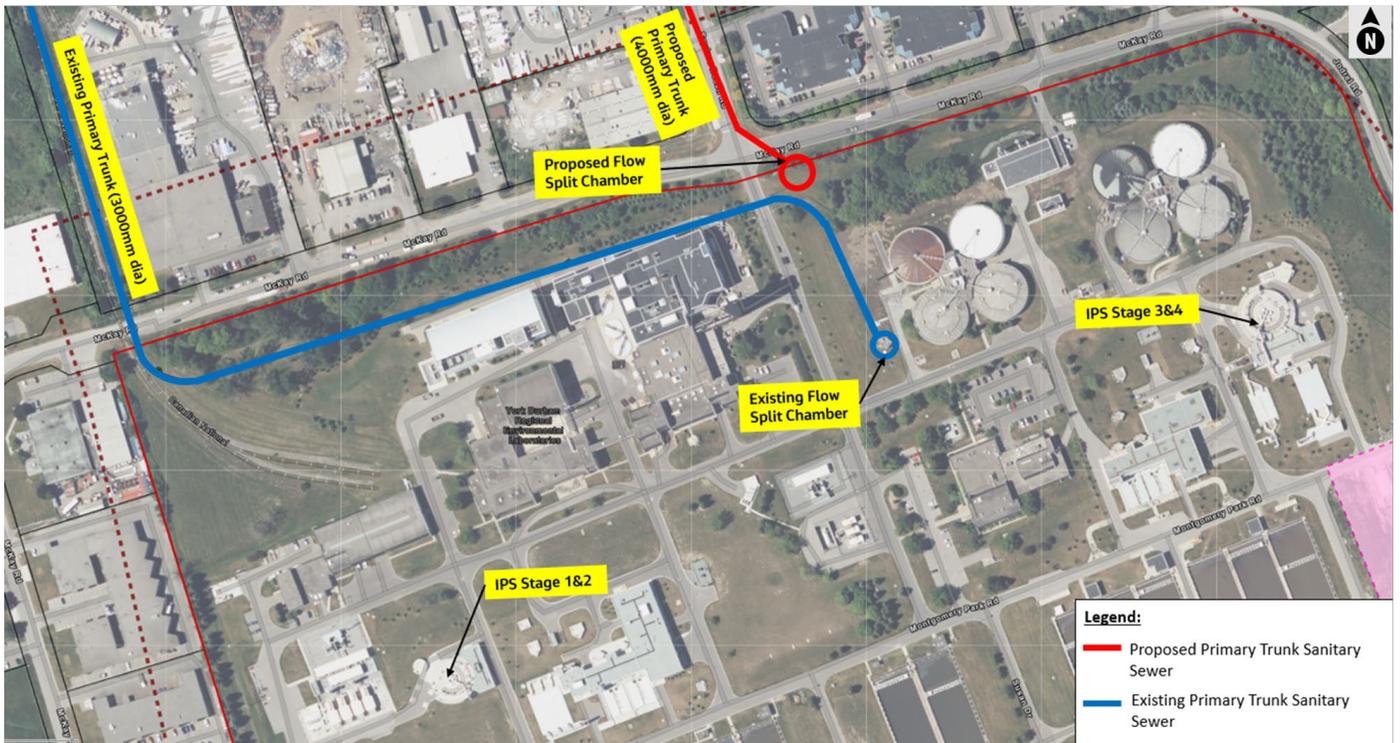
General Location and Layout of New Flow-splitting Chamber
